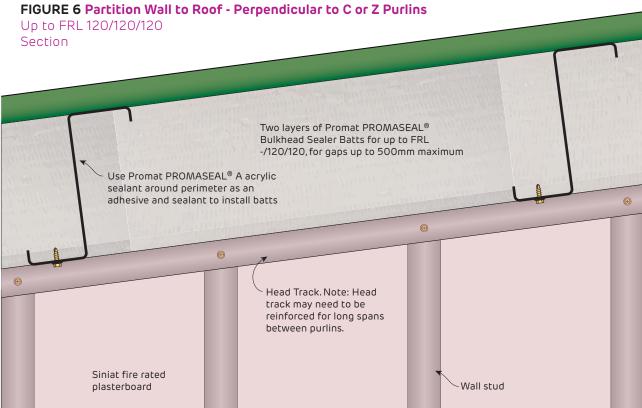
Partition Wall to Roof - Perpendicular to C or Z Purlins Up to FRL 120/120/120 Section
